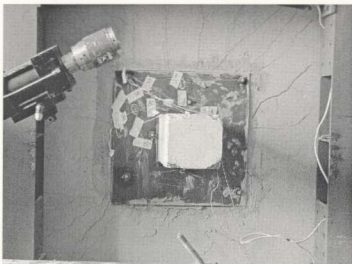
Specimen Steel-P5-1.0% after final testing.
